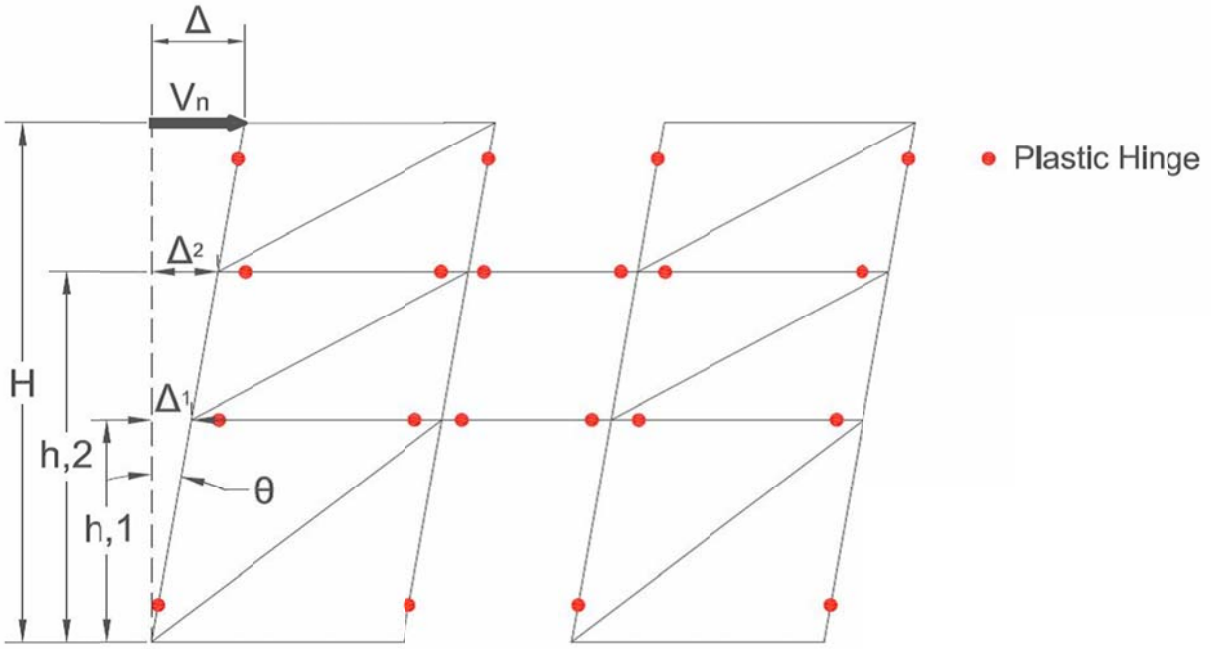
Plastic Collapse Mechanism (Pier 1 is Left Pier, Pier 2 is Right Pier)
